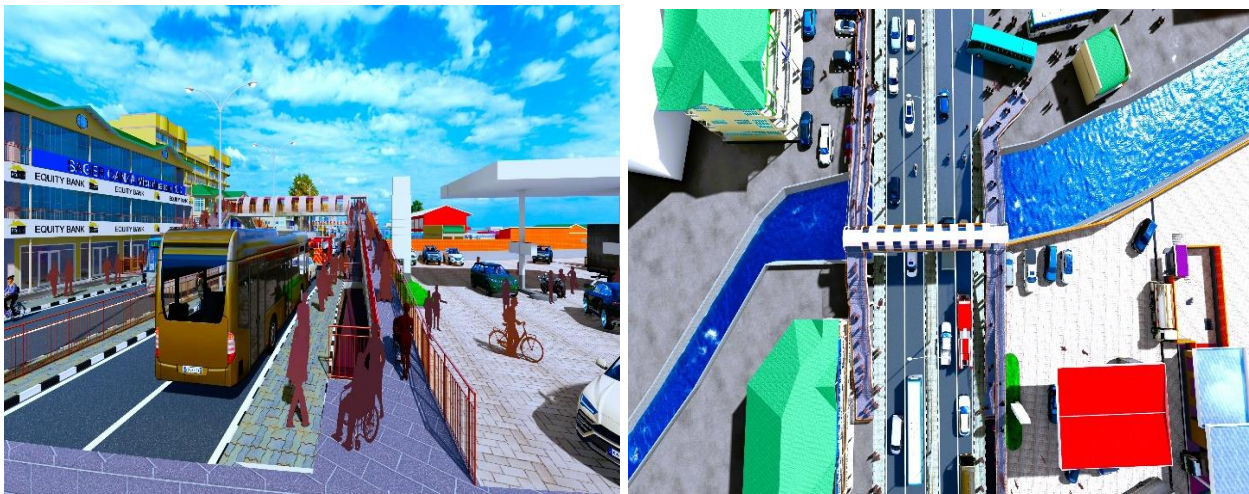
Proposed First bridge crossing road near Equity bank branch Nyabugogo.
